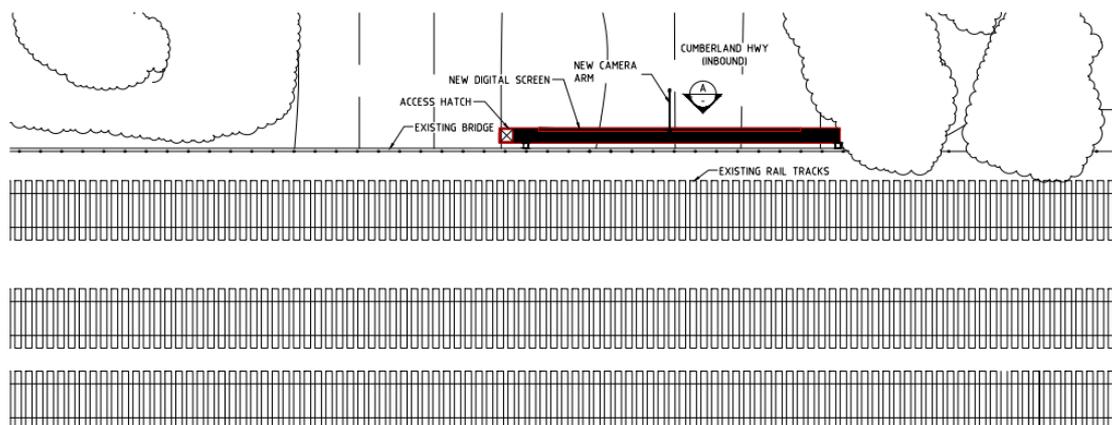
Proposed Site Plan (Source: Dennis Blunt Consulting Engineers)
